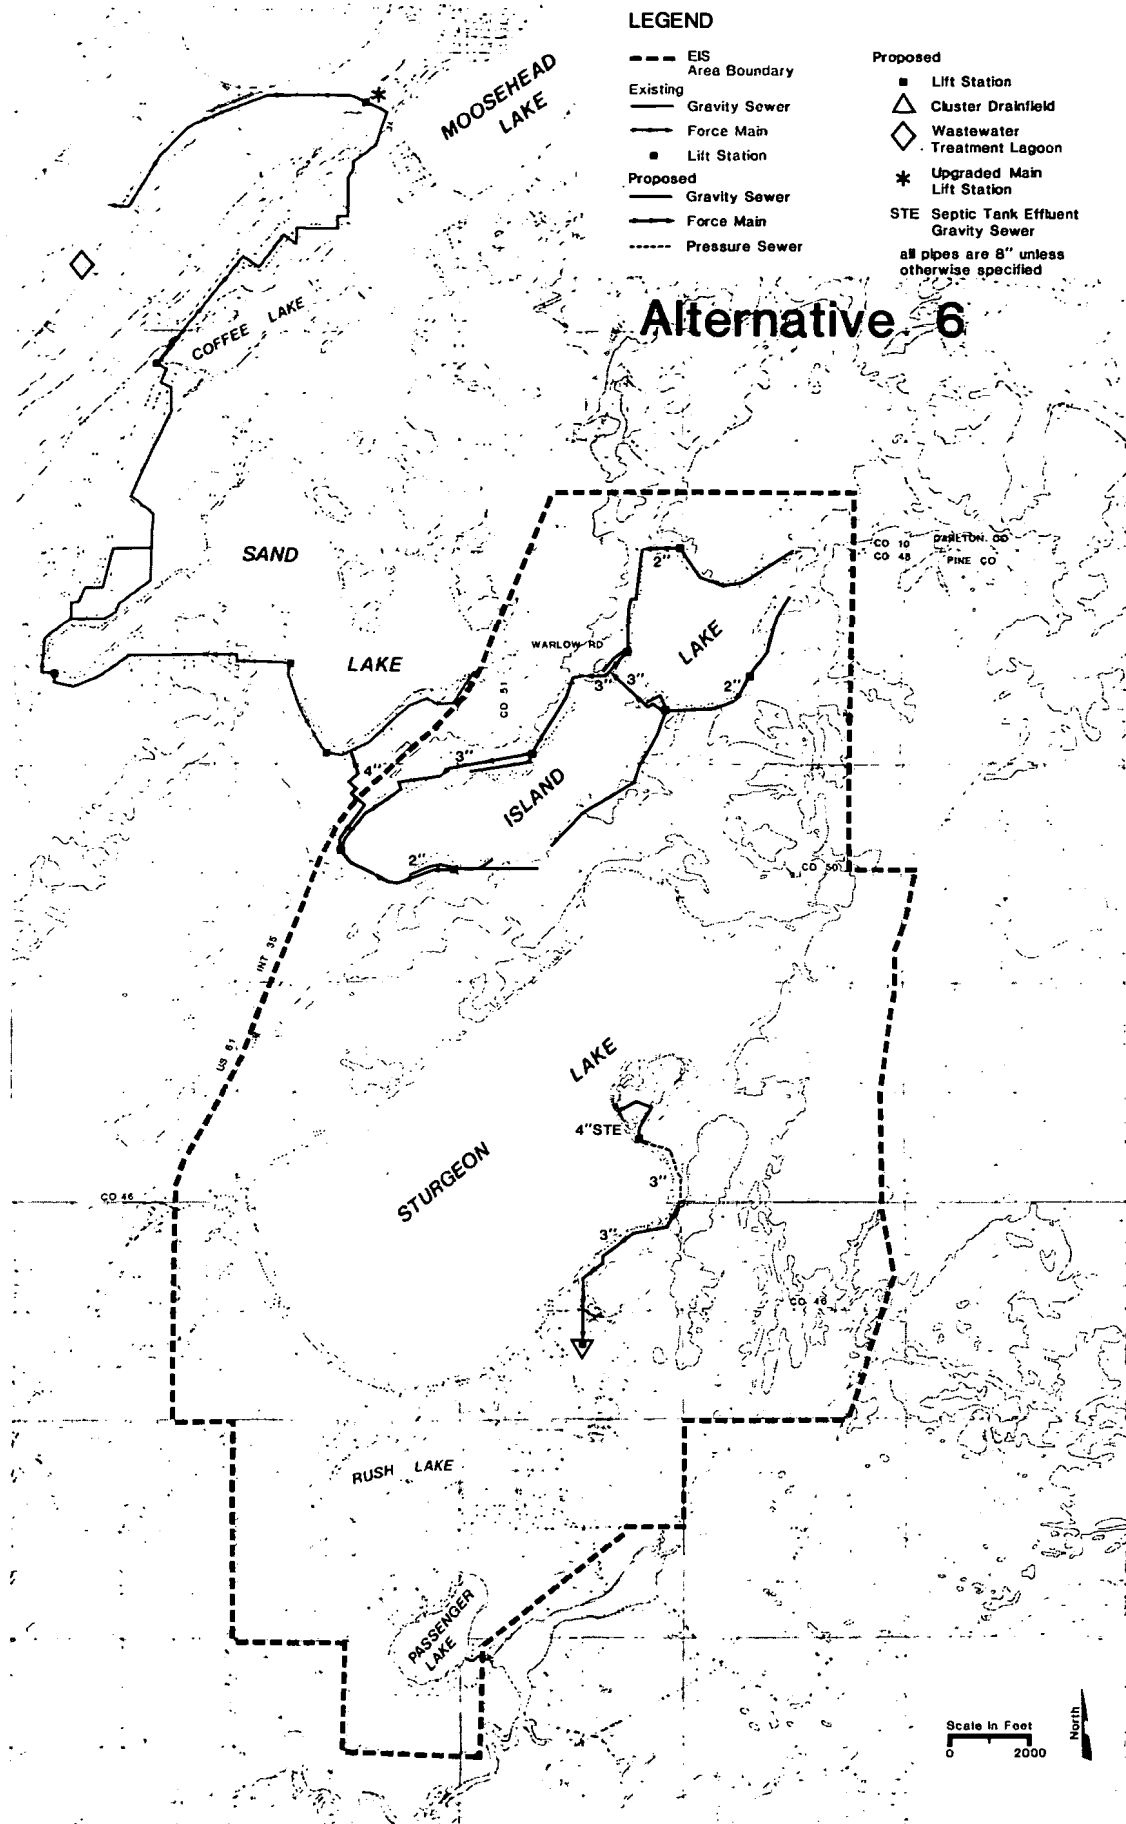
Wastewater collection and treatment facilities for Alternative 6
